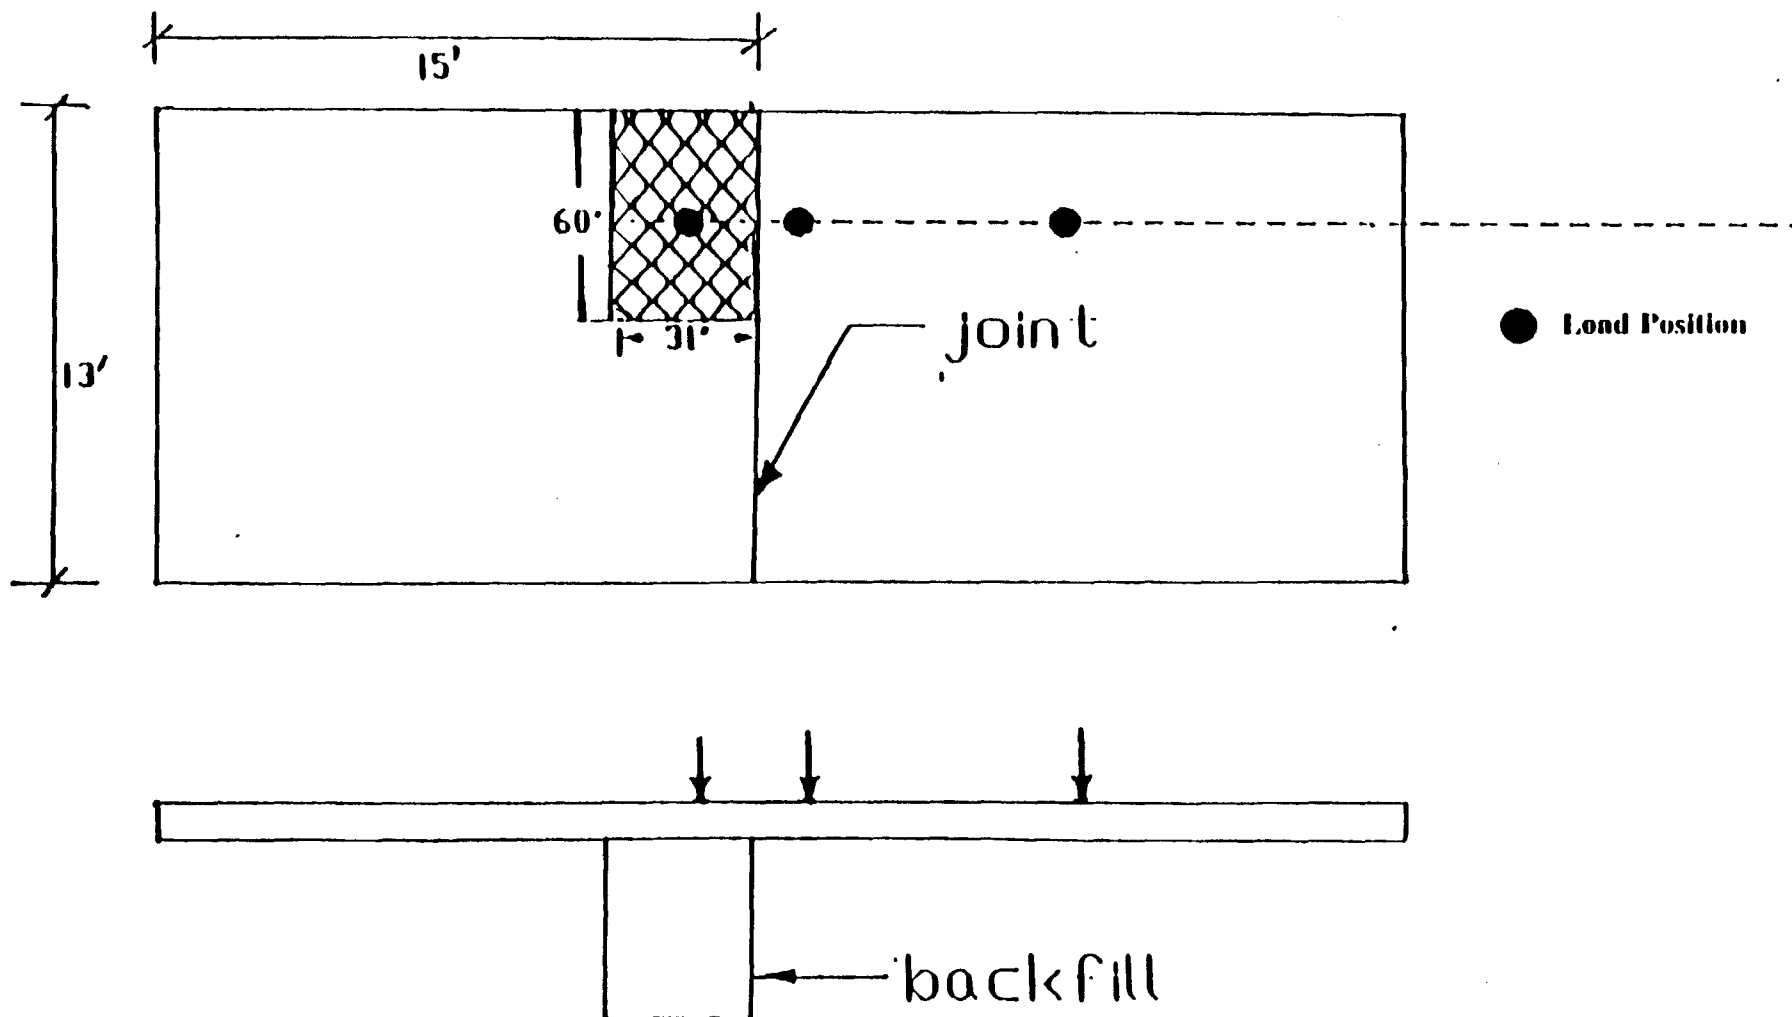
Layout for Dynaflect Tests on Calvert Street
